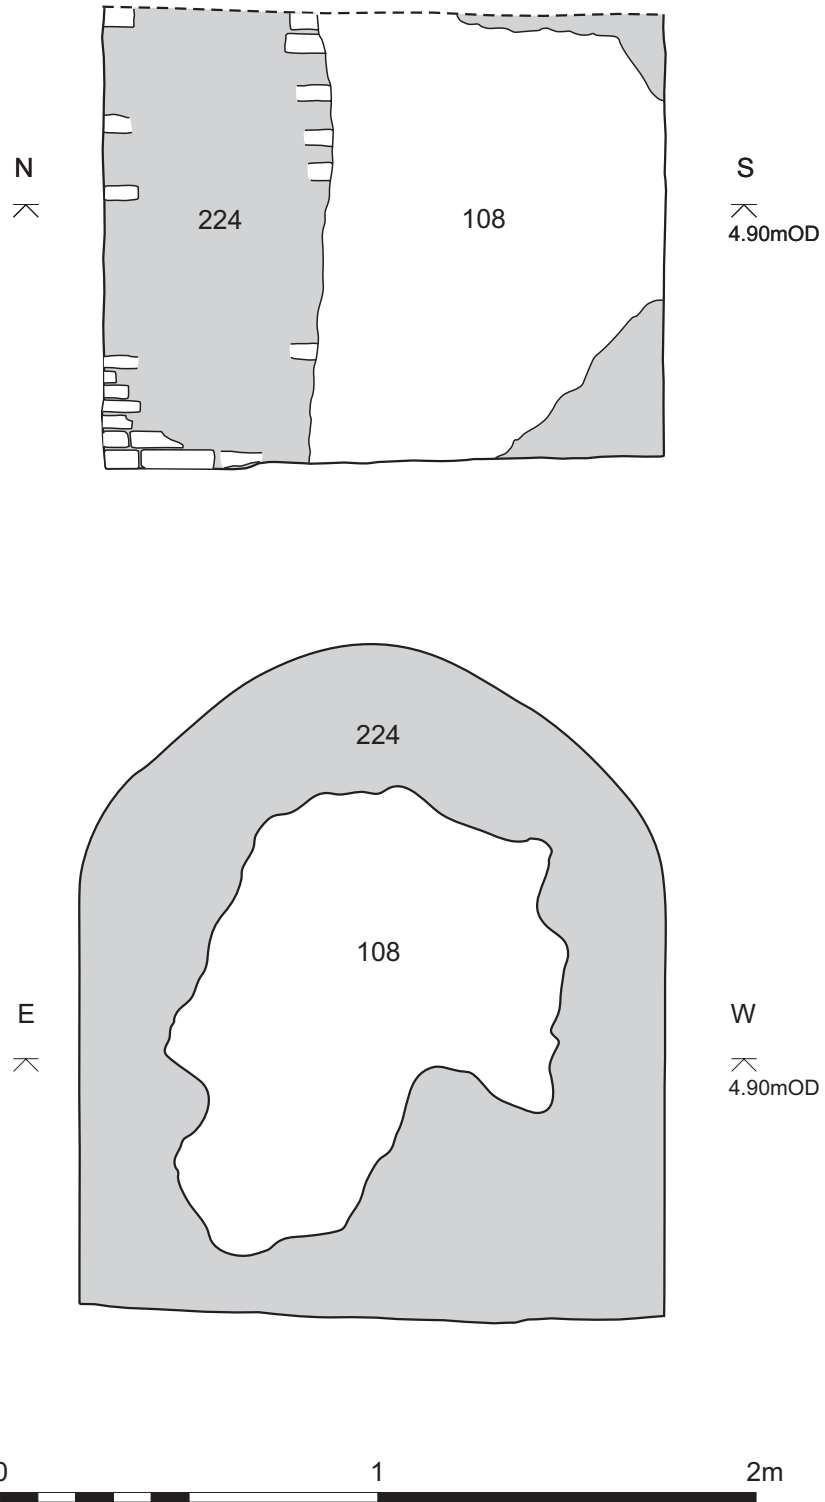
Trench 1; (top) west-facing and (above) north-facing internal elevations of the cellar side chamber. Scale 1:20
